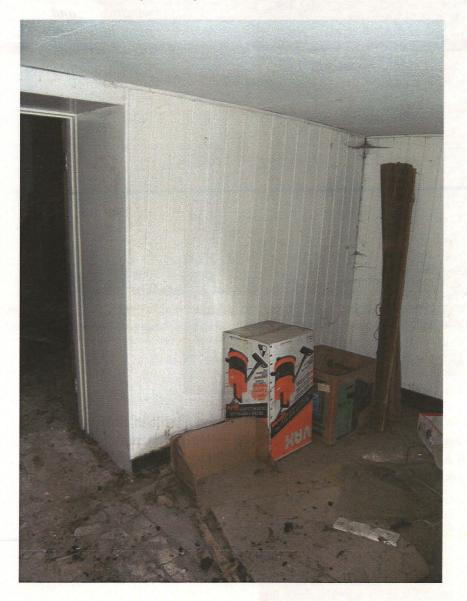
Interior of 2ARoom showing thick wall and doorway to Room 1a, looking southeast
